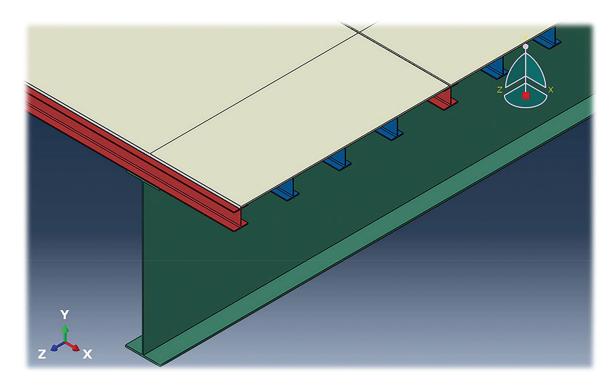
Preliminary finite element model of a bridge with an inverted WT deck system.
